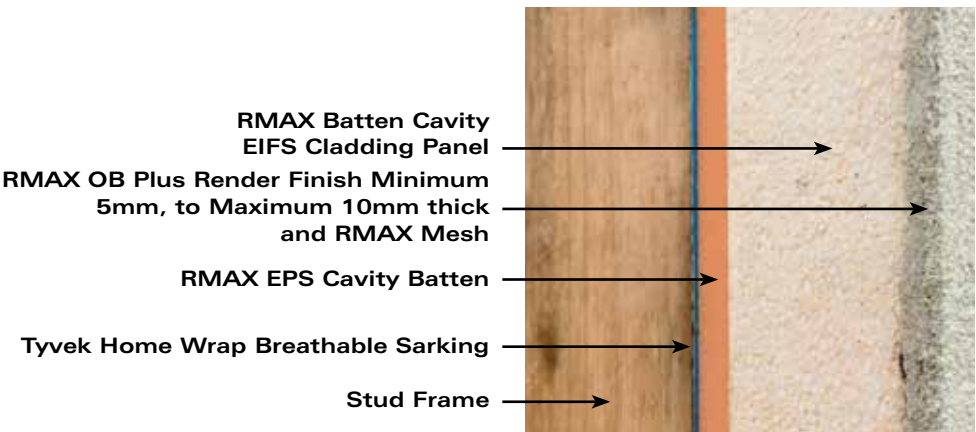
Cross section of complete RMAX Batten Cavity EIFS System.
